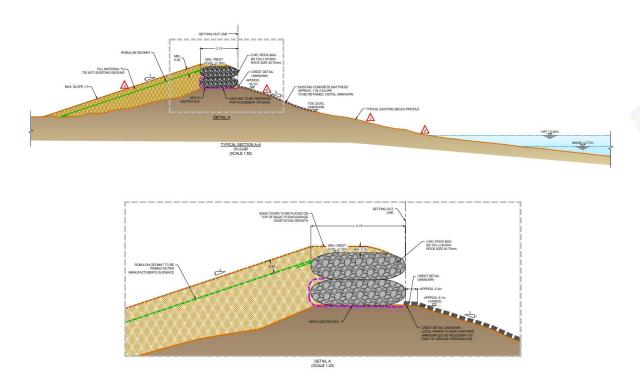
Cross-section of proposed works at Porth Coose (HR Wallingford, 2
